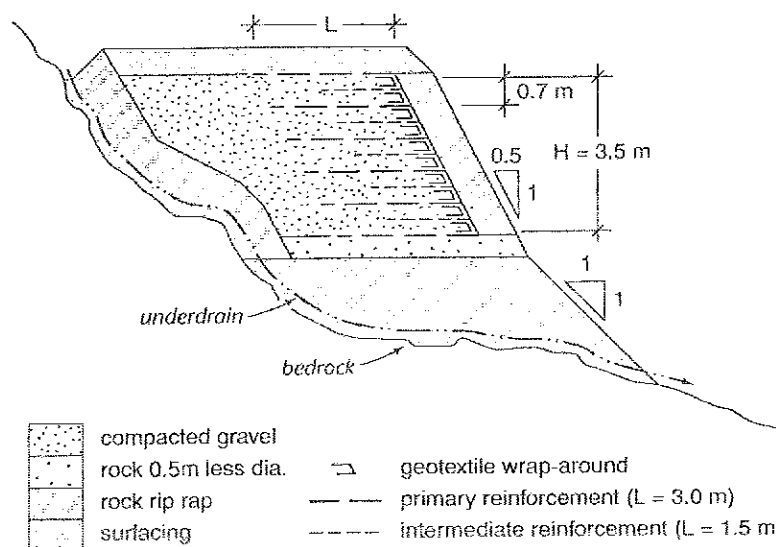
Foley Creek reinforced soil slope : cross-section view.
